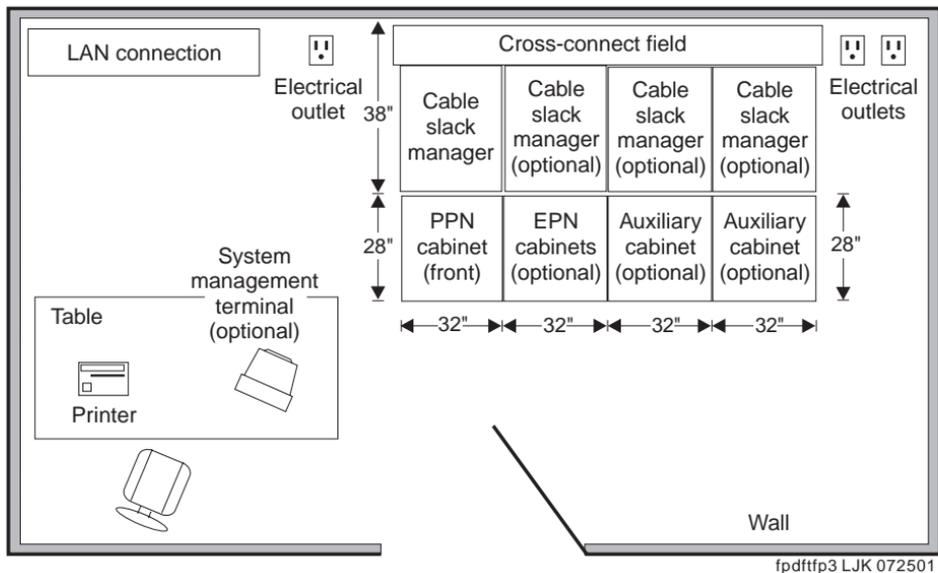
Typical Floor Plan with an additional EPN and Auxiliary Cabinets
